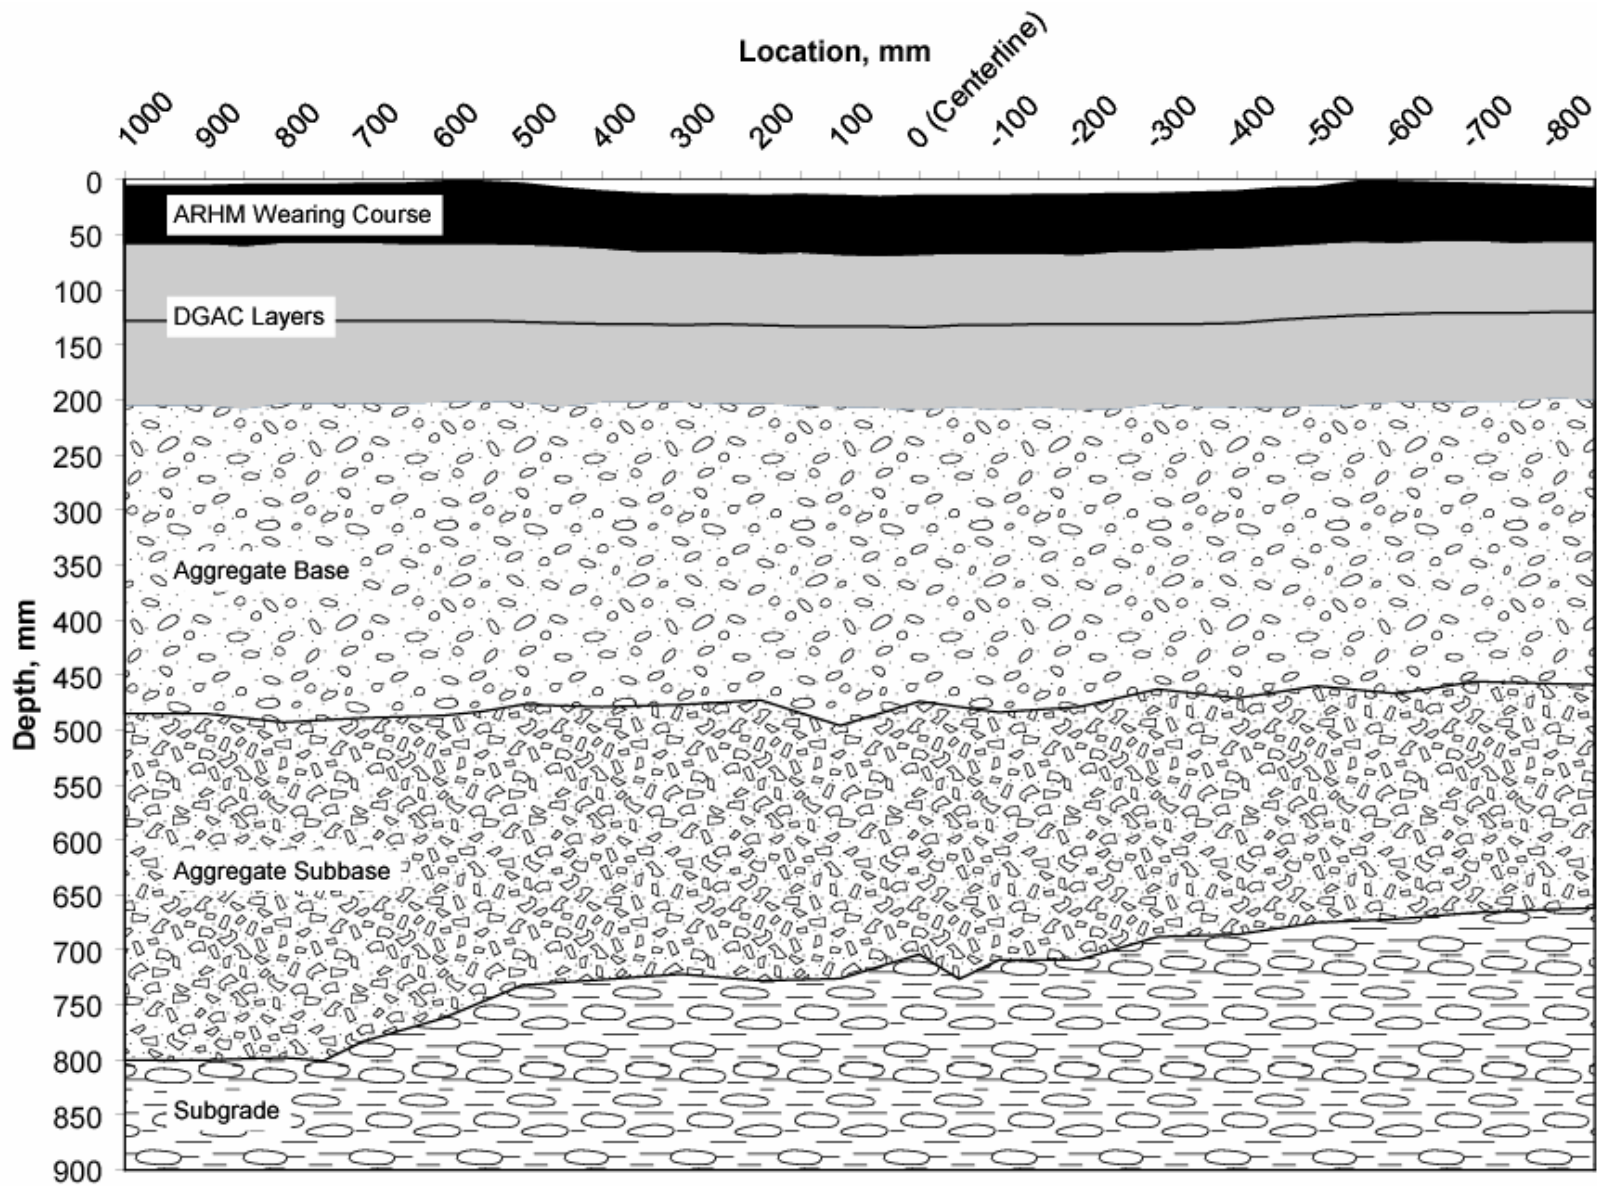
Trench data, south face of trench at Station 5, Section 544.
